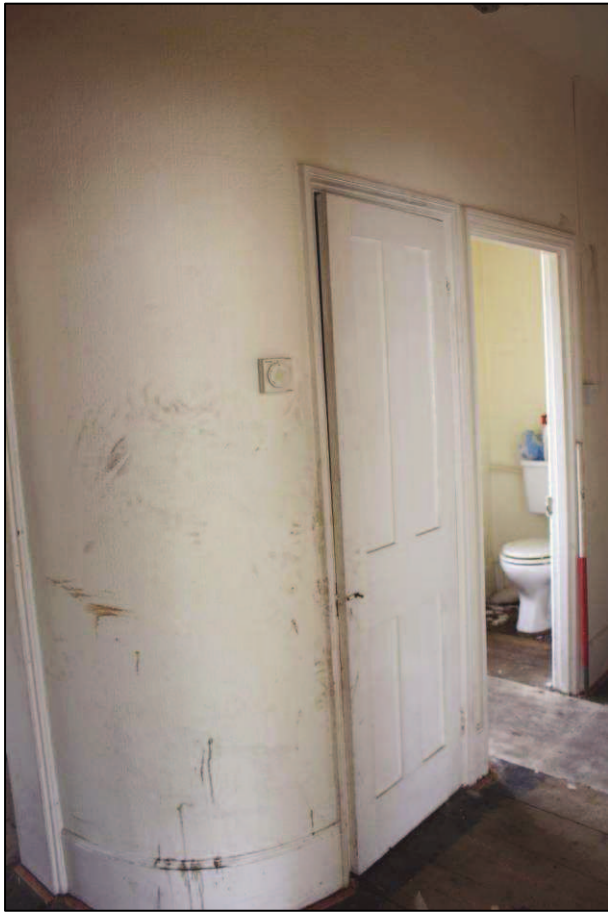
(Shot 29): Curved corner in the first floor corridor, looking northwest, 1m scale
